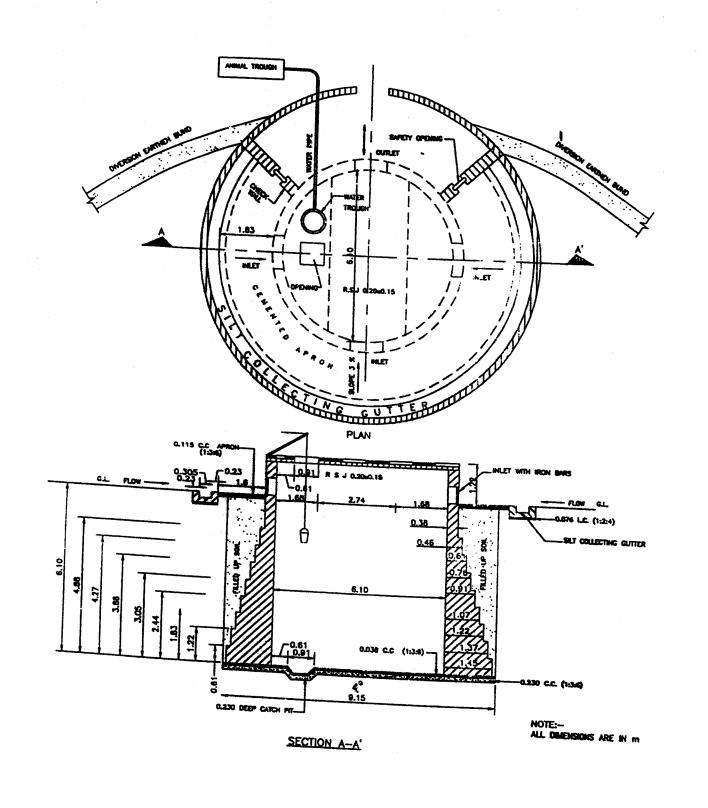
Plan and Sectional Detail of 200 cum Capacity Tanka
